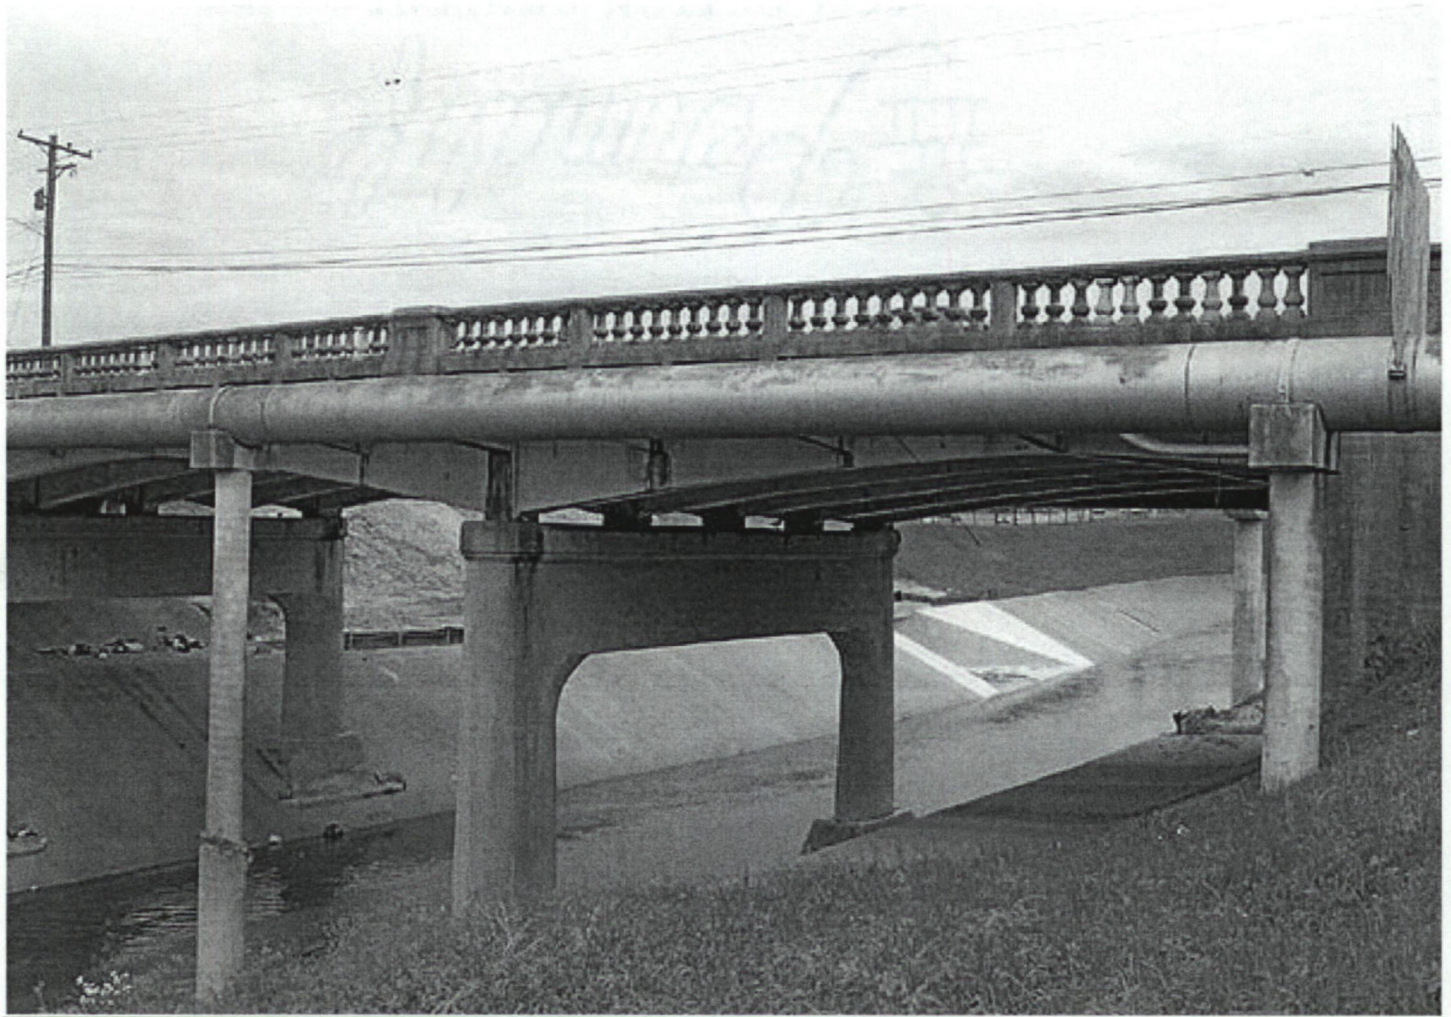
Almedea Road Bridge over Brays Bayou, facing east. Photo by Greg Harmon.
